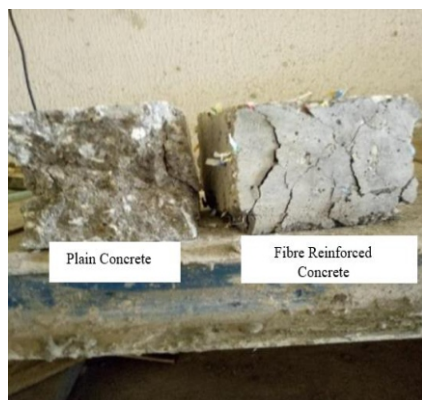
Comparison of failure modes of concrete specimens with (fibre reinforced concrete) and without WMPF fibre (plain concrete) after subjected to compressive load
